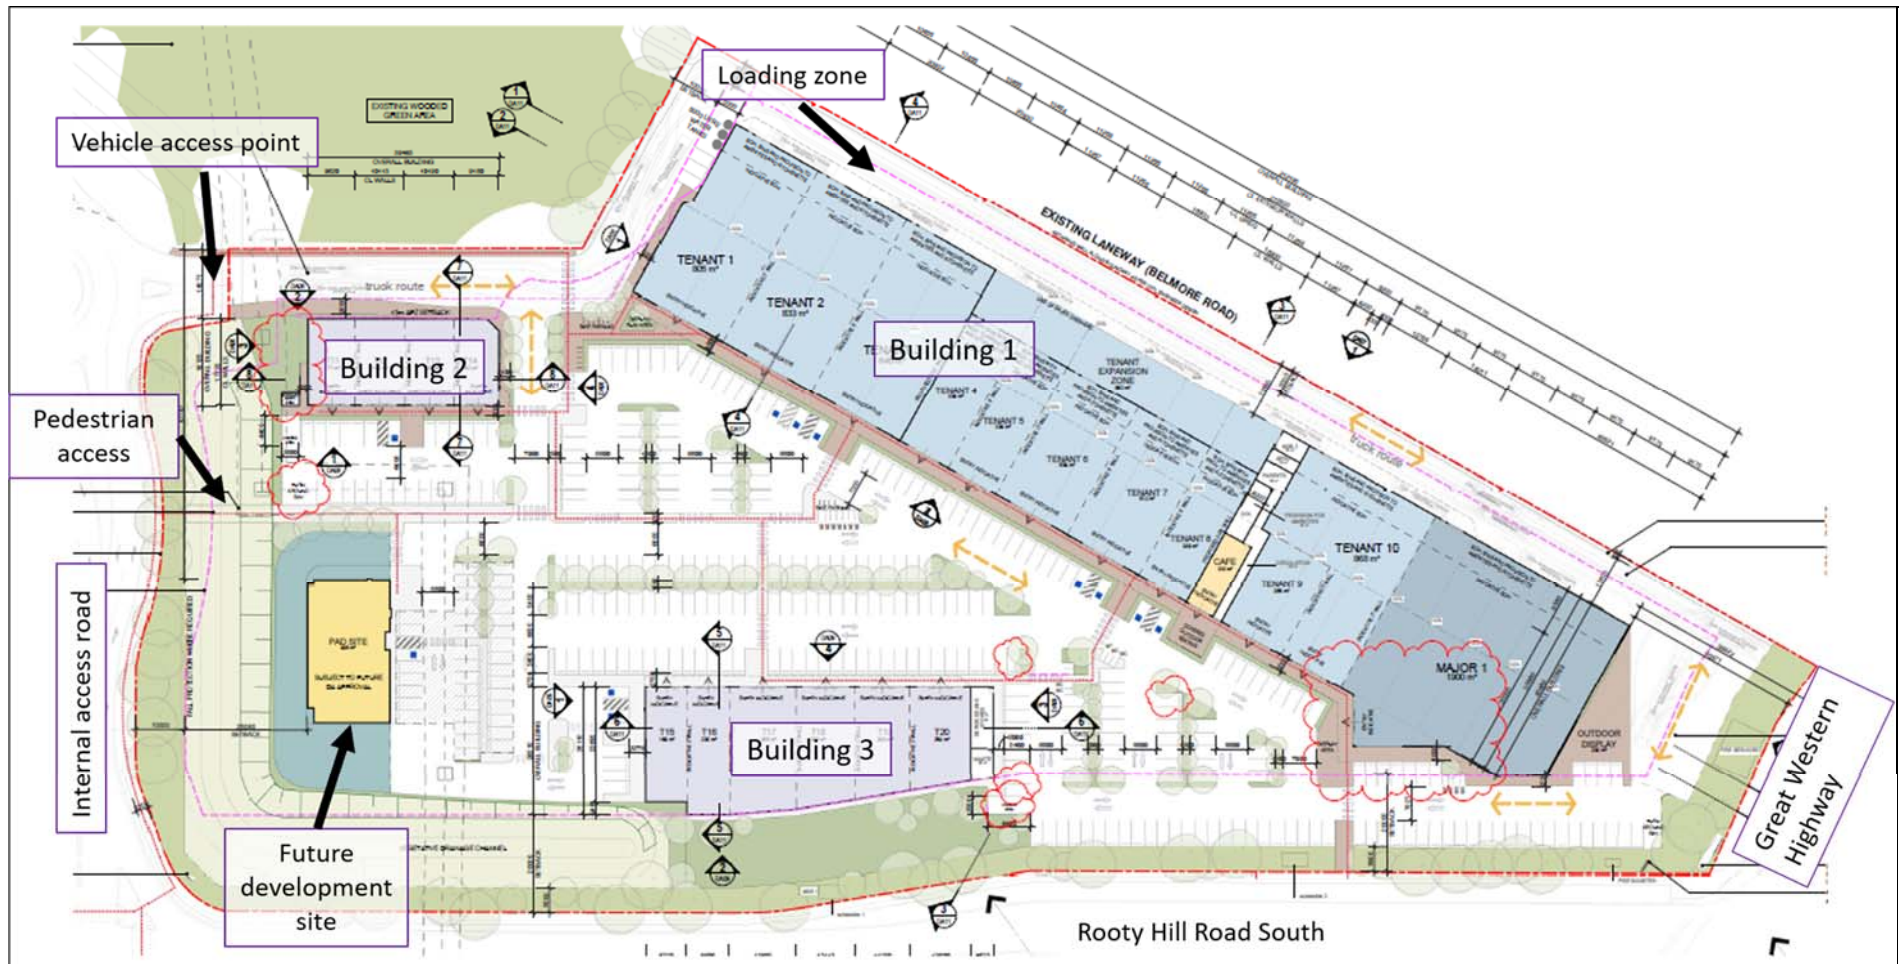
| Proposed detailed design for specialised retail centre, Lot 1
